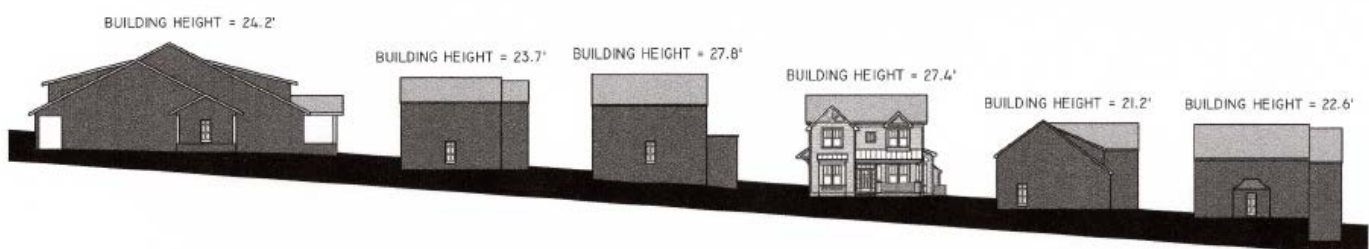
Rendering of proposed dwelling to compare massing with nearby existing dwellings as from Virginia Avenue
